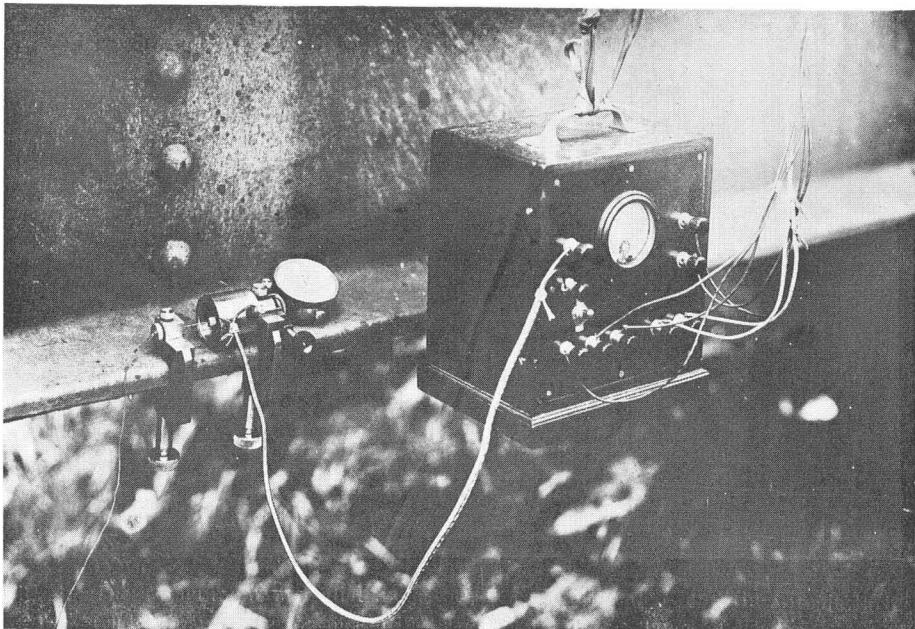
The Attachment with dial indicator for calibration (left) and the Circuit Box (right) in position for measuring stress of the lower flange of I-beam.
